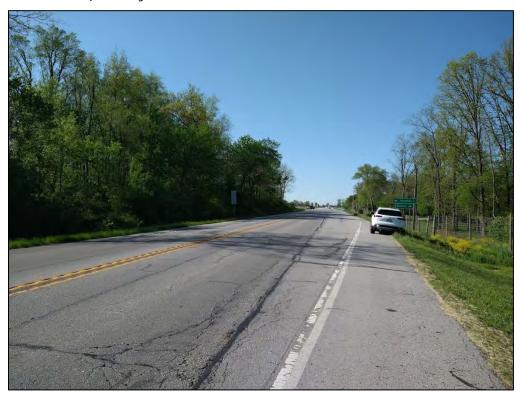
Streetscape along SR 13 from a location approximately 500 feet north of the project intersection, facing south.
